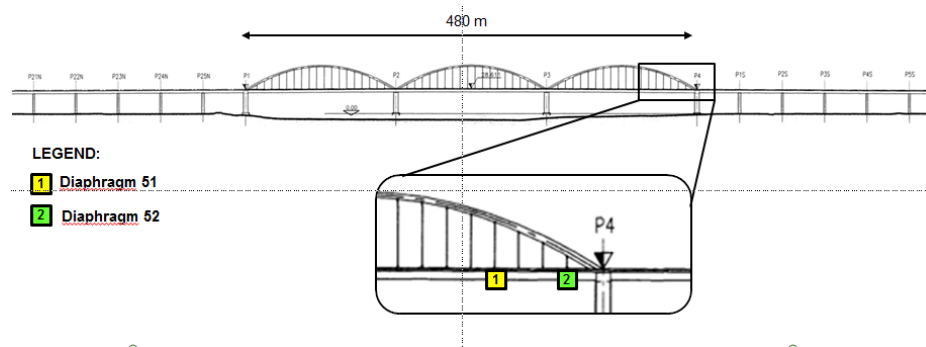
Location of diaphragms 51 and 54 on bridge.
